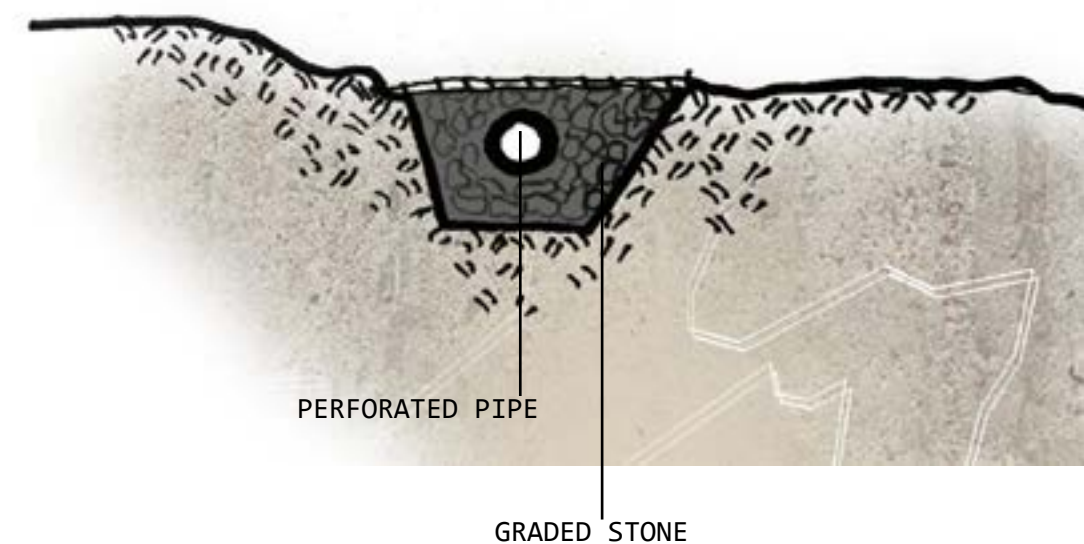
C: French drain [DETAIL 1] (Author, 2021)
